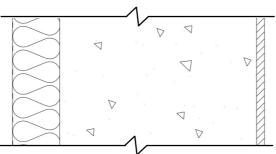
Reinforced concrete wall constituted by: XPS (ETICS) (6 cm) | Reinforced concrete (25 cm) | Plaster (1 cm).
